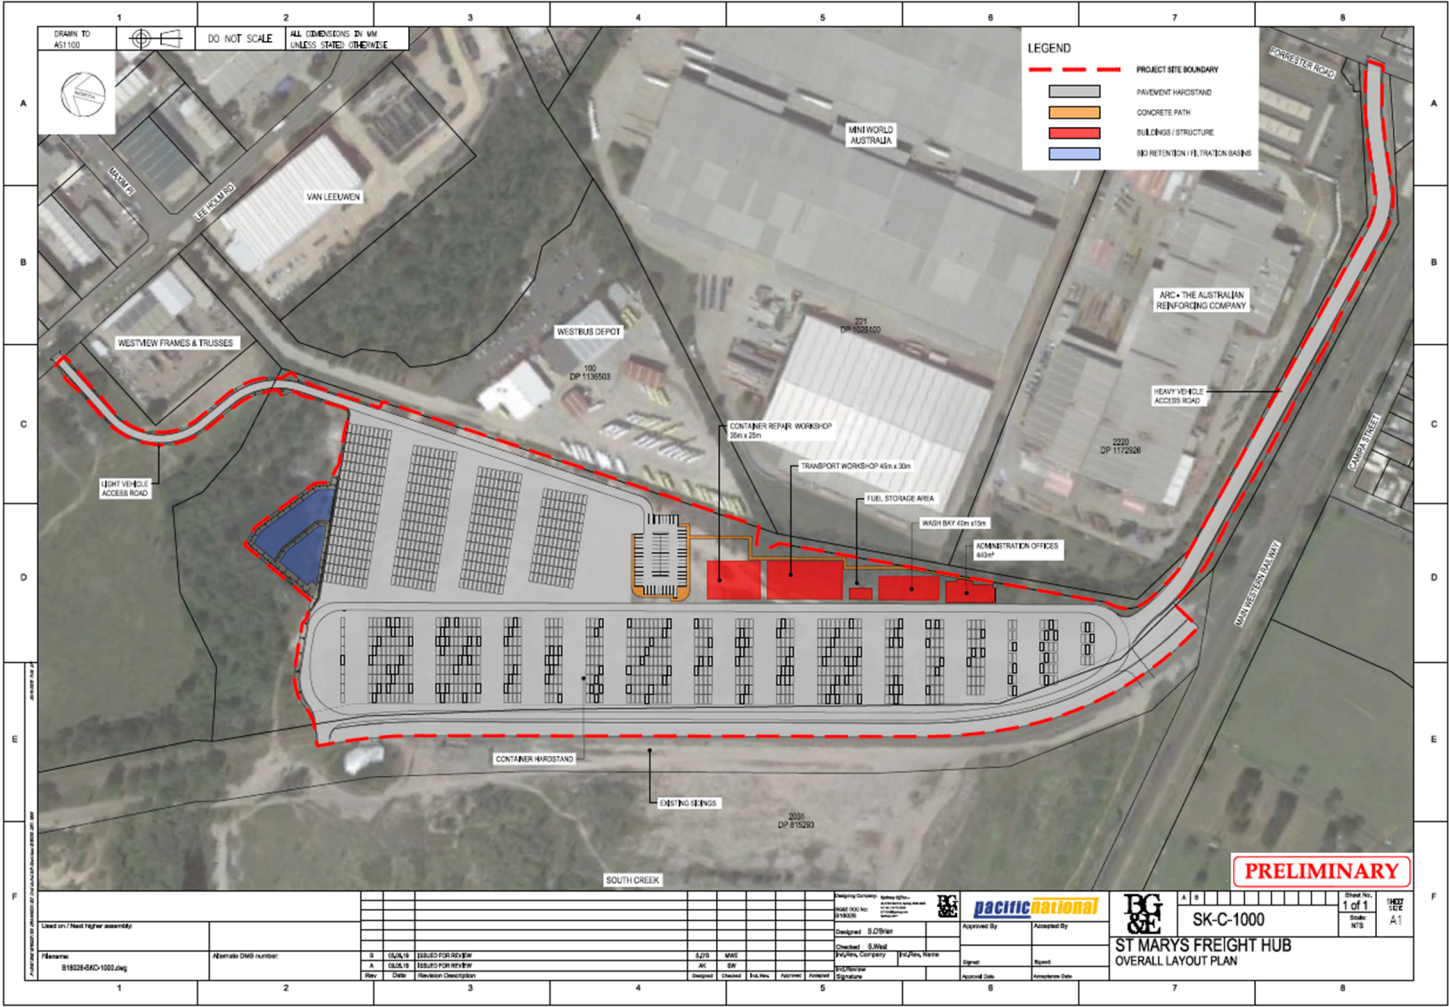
UPDATED – OVERALL LAYOUT PLAN
